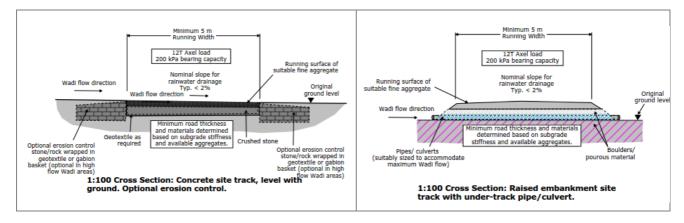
Typical site road cross-sections (source DNV GL, 2016)
